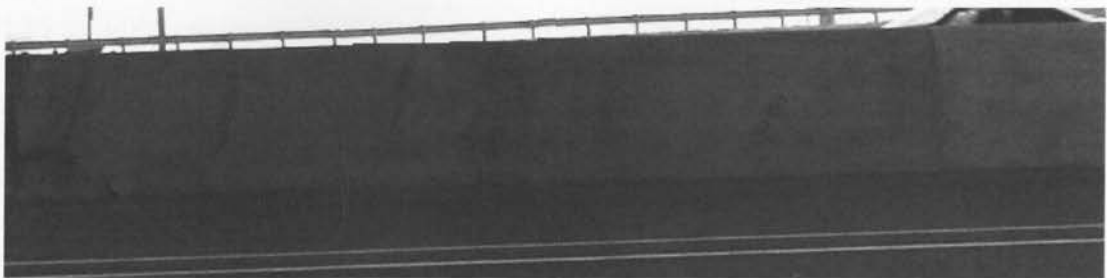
Photo of a plain concrete wall of approximately 8-10 years of age with vertical cracks
